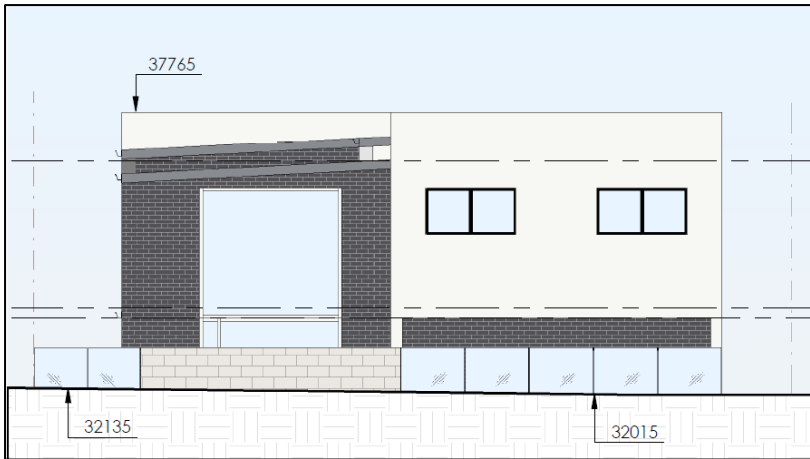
Approved Southern Elevation (note: Condition 6 imposed to relocate Bedroom 1 to the void area)
